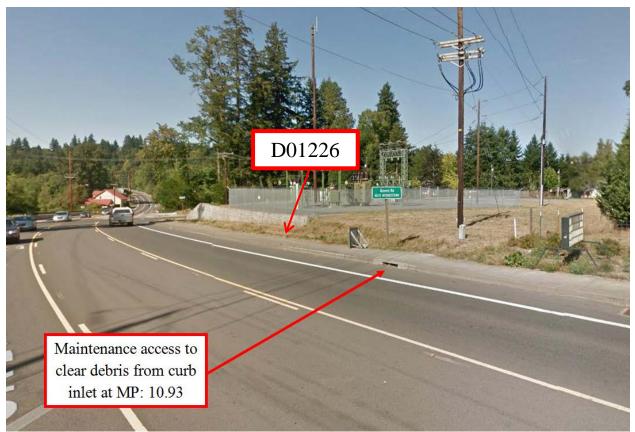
Maintenace access for clearing curb inlet to swale, looking northeast
